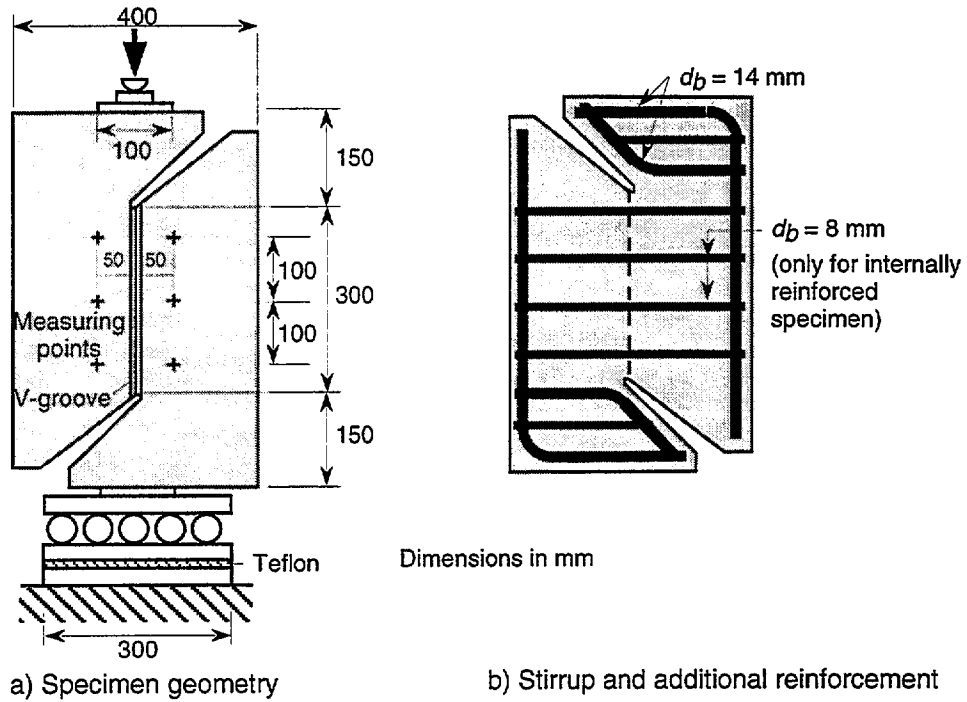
Push-off test specimens to study aggregate interlock in cracked reinforced concrete: (a) geometry ; (b) reinforcement (Walraven and Reinhardt 1981)
